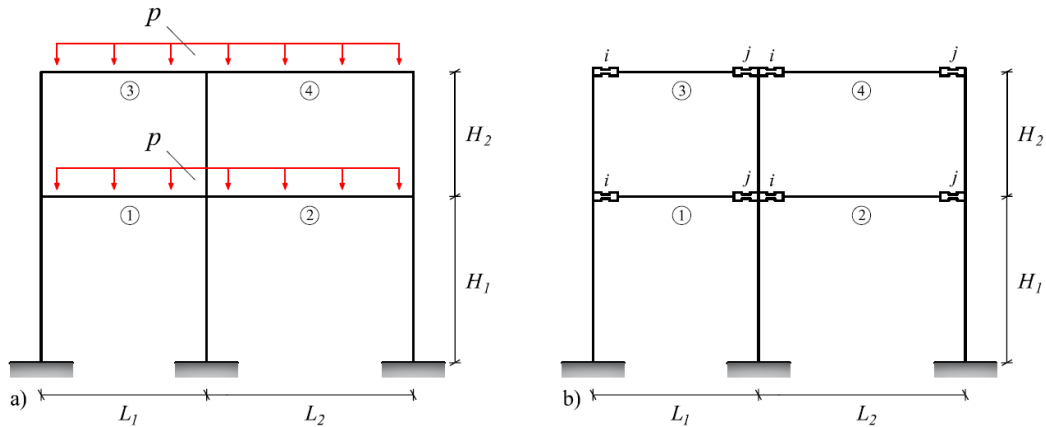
Steel plane frame: a) geometry and load condition; b) position of the LRPD.
